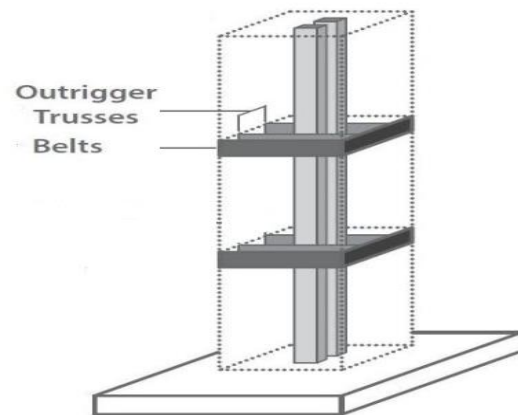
Core Wall and Outrigger Belt truss (credit: CTBUH)
